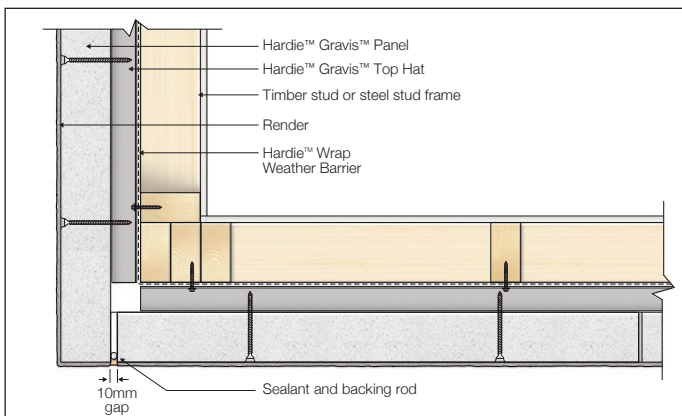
CONTROL JOINT AT EXTERNAL CORNER
